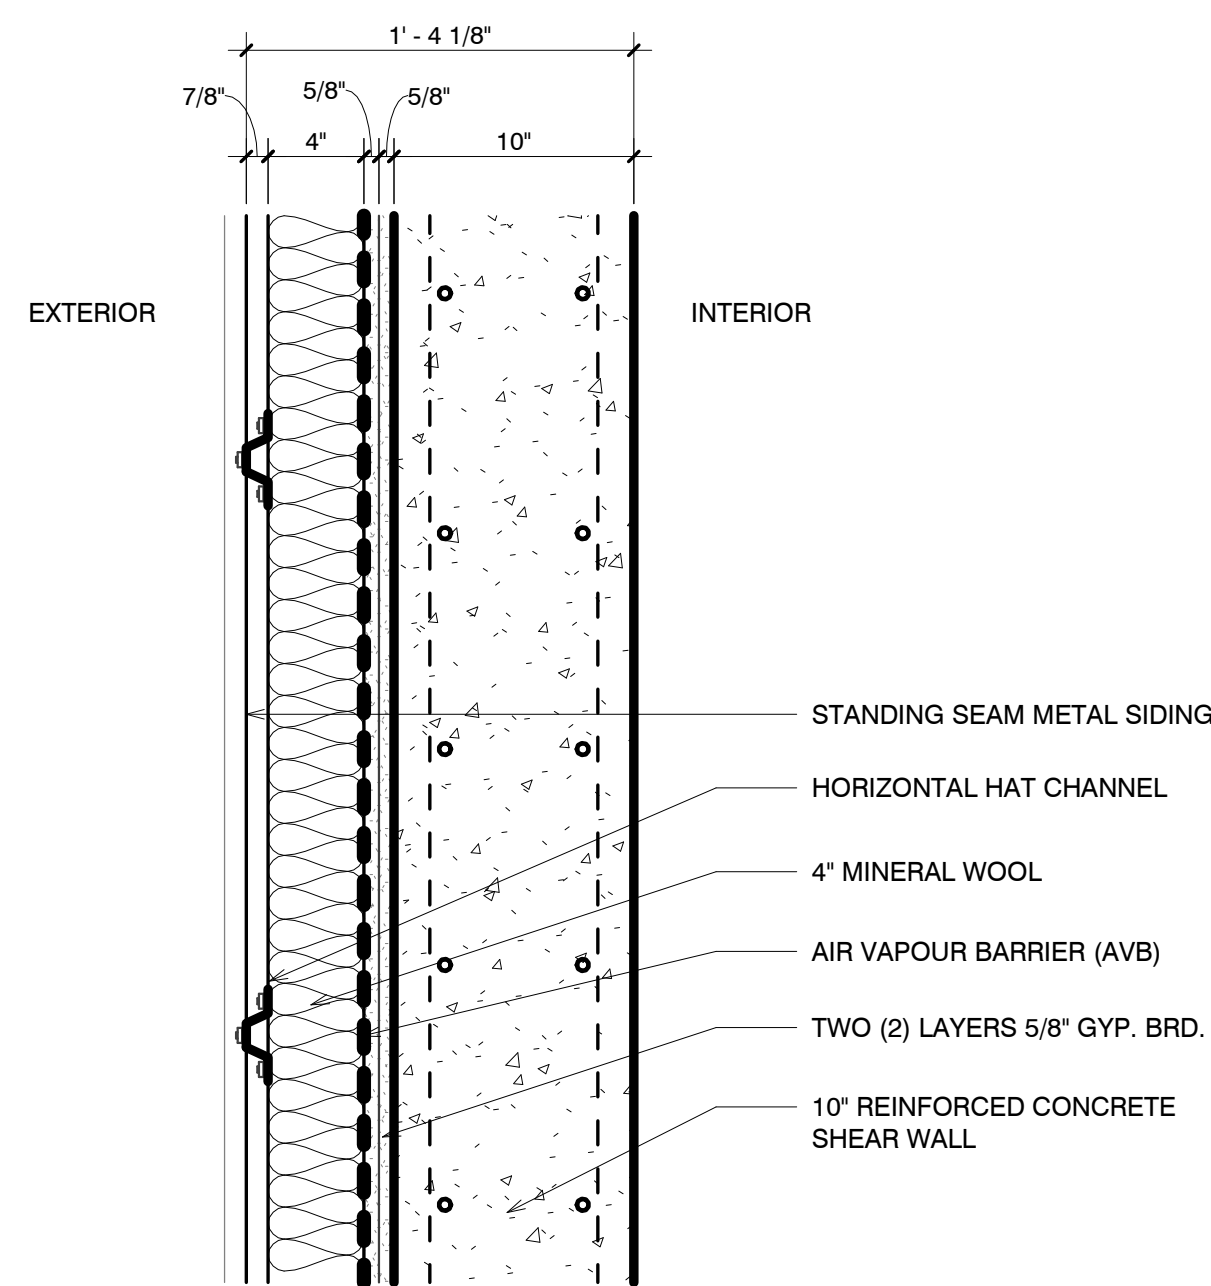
DETAIL - EXT. WALL - 2 HOUR (C1) 6
